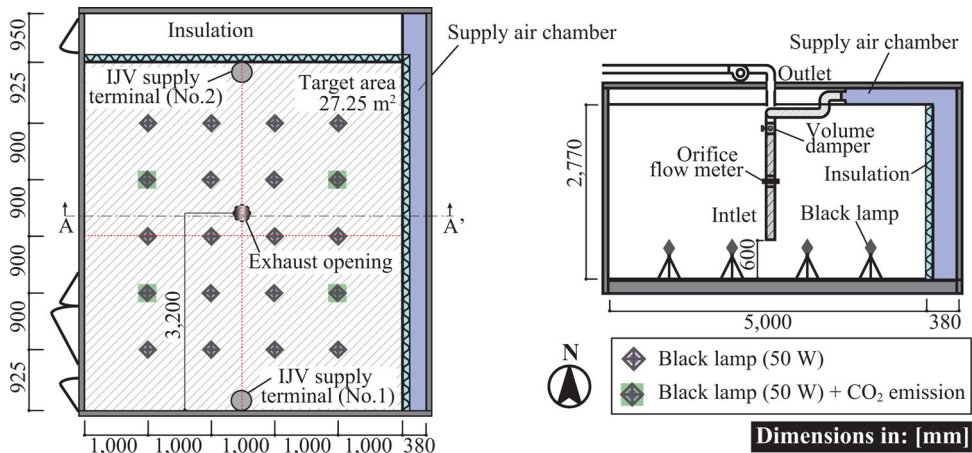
Experimental set-ups (Left: Floor plan, Right: A-A' Cross-Section).
